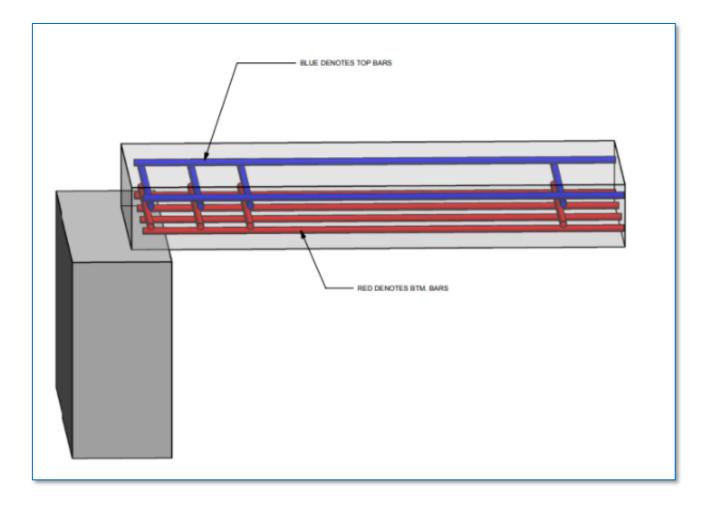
Typical position of reinforcement with RAAC planks. Institution of Structural Engineers (2022)
